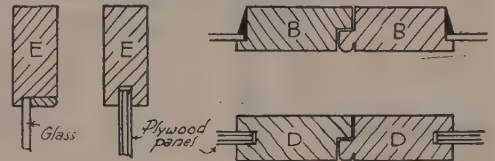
DOOR SECTIONS. FIG. 4.—MEETING STILES OF DOORS.
